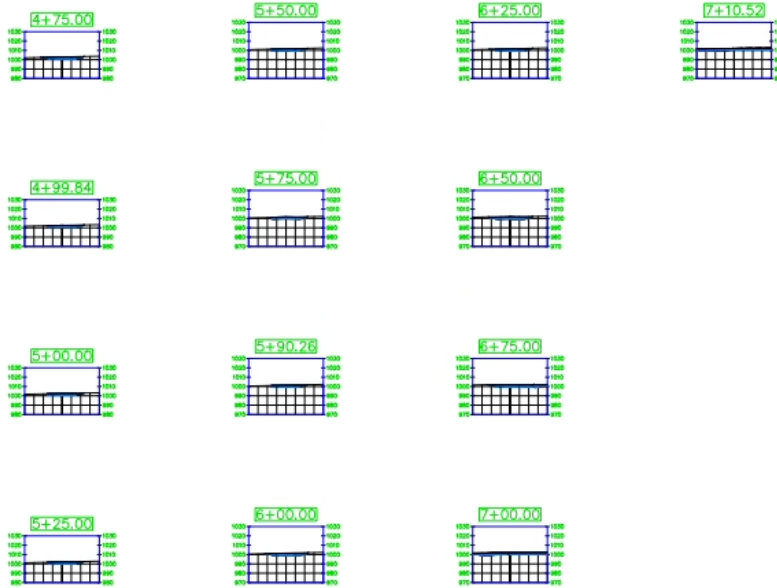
G: Early Stagecoach Road Cross Sections STA 4+75 to STA 7+10.52
